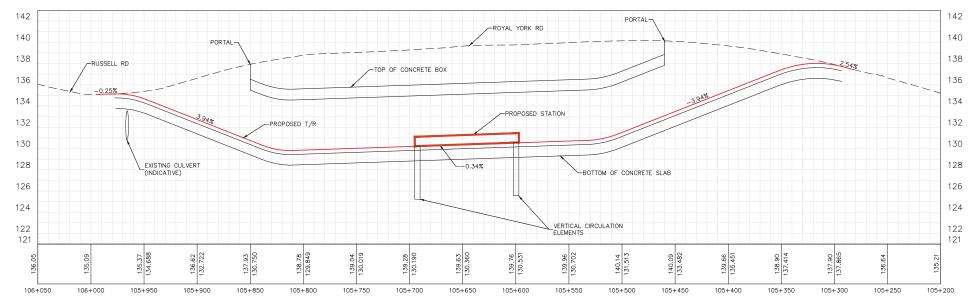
Plan and profile of the grade separation that was studied at Royal York/Eglinton.
